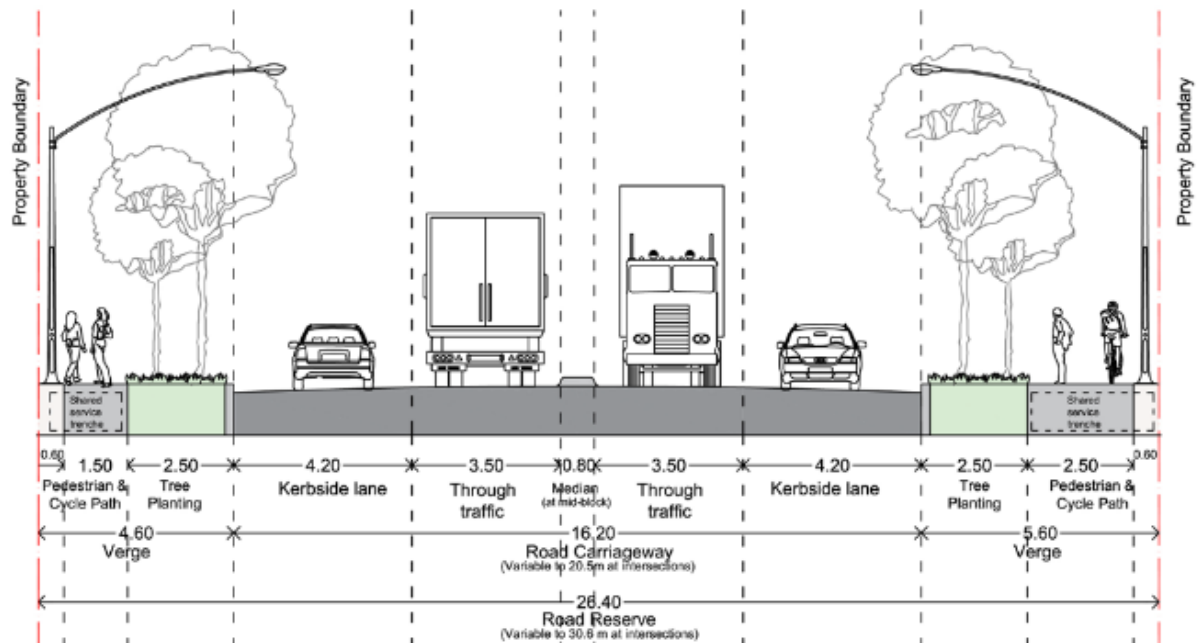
Distributor Road Cross Section-Mamre Road DCP
